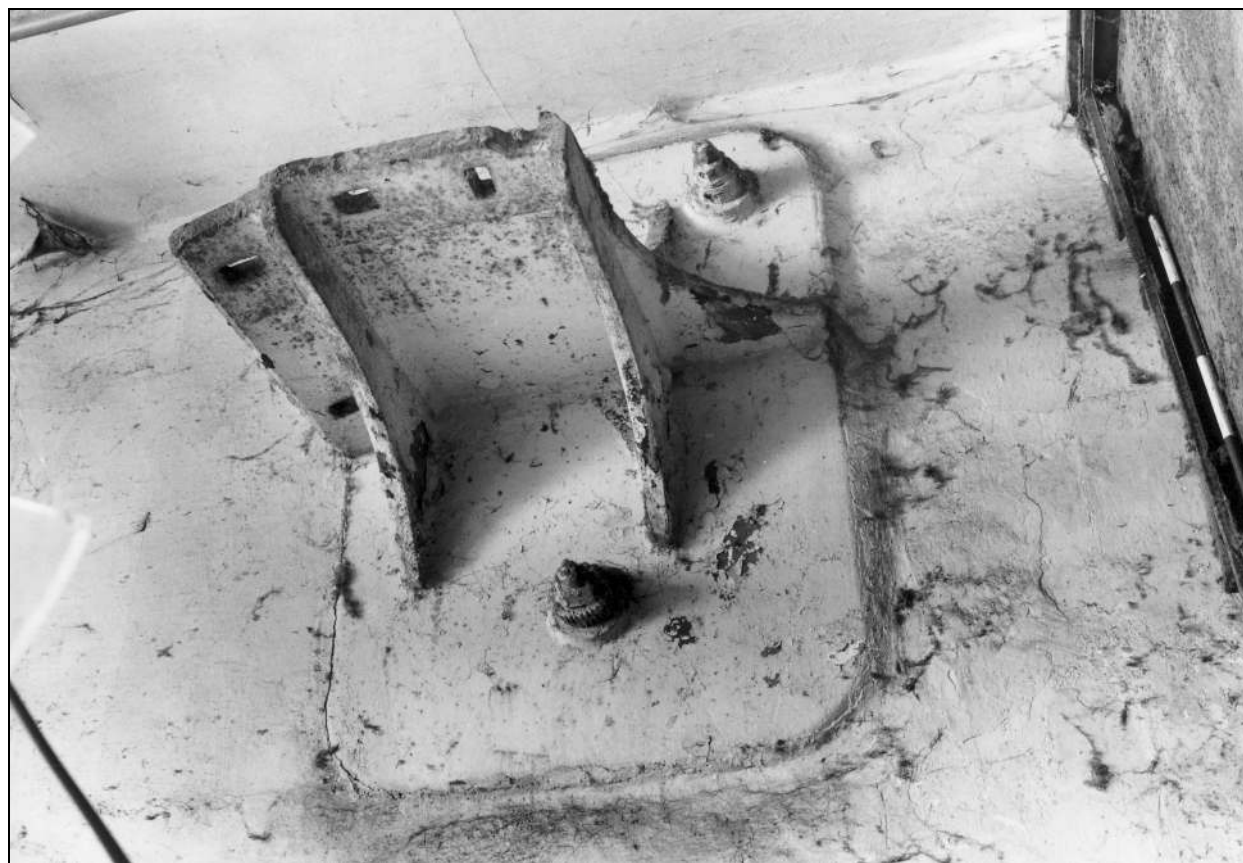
First floor of spinning mill: detail of shaft bracket in west wall (film 3, frame 9)
